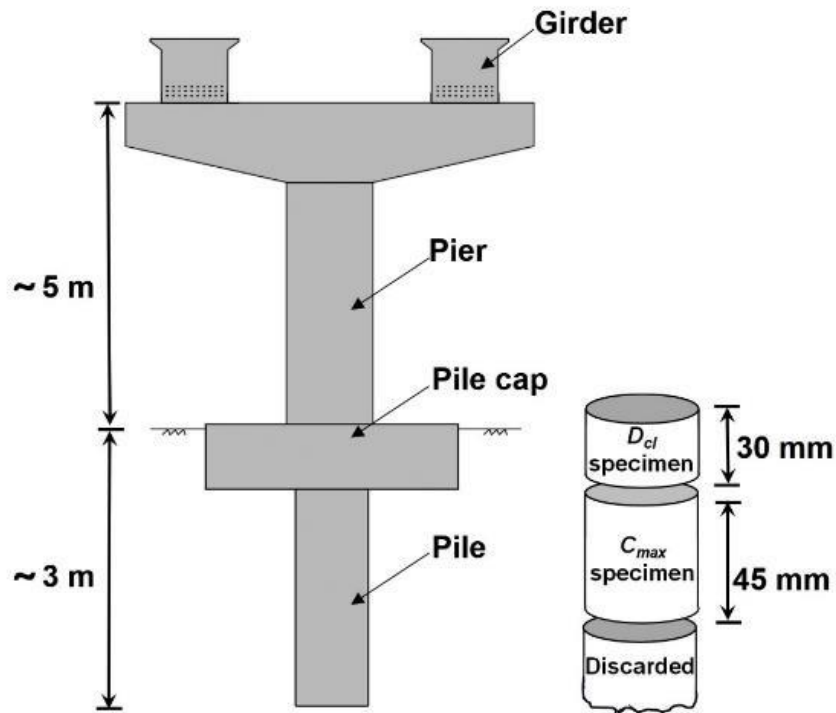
Schematics of the bridge elements under study and cylindrical concrete specimens cored from the bridge elements [Not drawn to scale]
